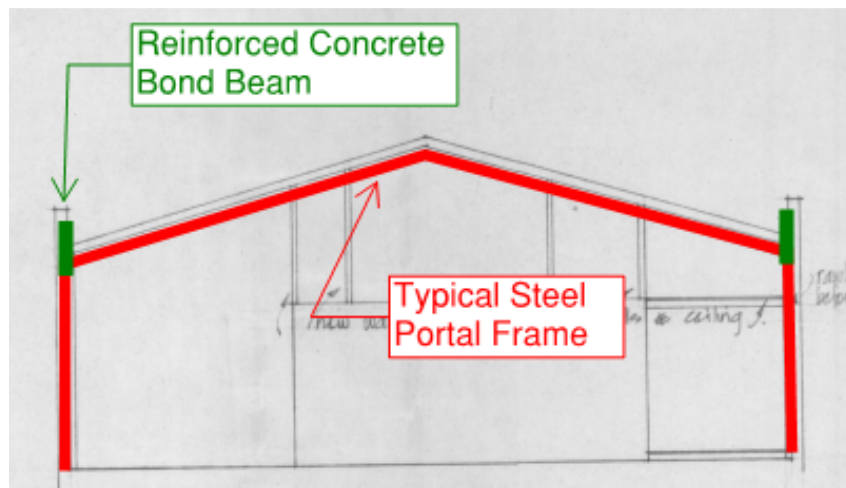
Section 1 - 1960's Original Steel Building Cross Section
